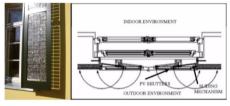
The photovoltaic Louvers installed in the building envelope openings.
